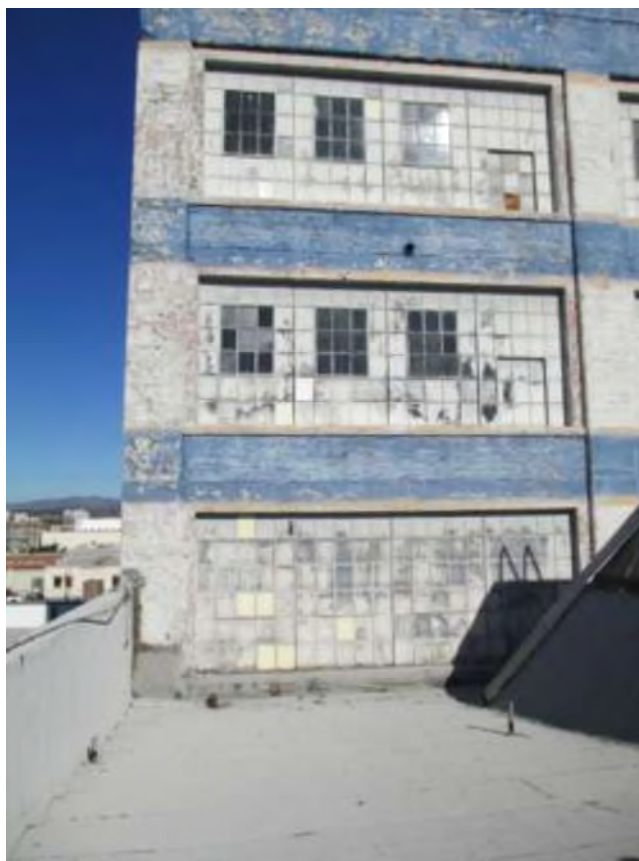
2-Story 2060 East 7th Street Building – From roof.
